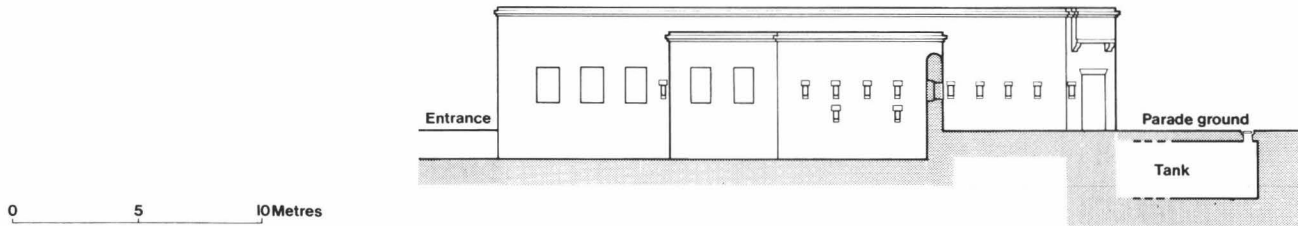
Reconstructed elevation drawings of the barracks based on old photographs and new survey.
